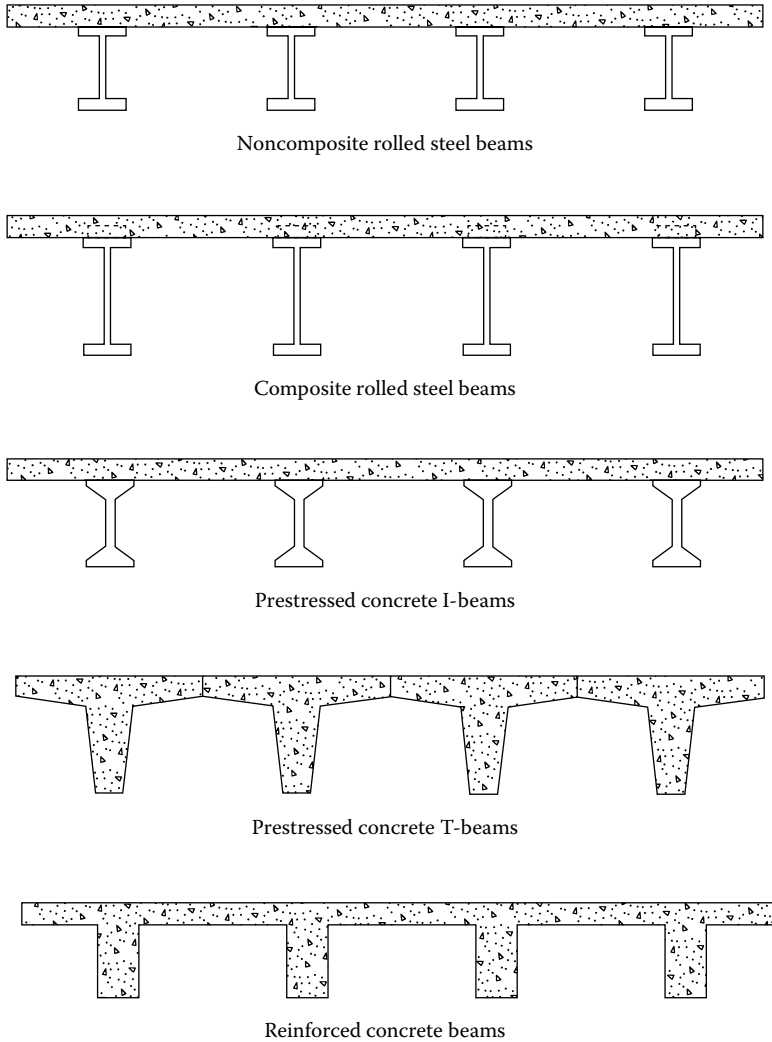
Examples of concrete deck systems. Except for prestressed concrete T-beams, the concrete deck spans transversely over the beams (steel or concrete). The primary reinforcement in the deck is placed *perpendicular* to traffic, and the same method is used for their analysis and design irrespective of the type of supporting beams.
